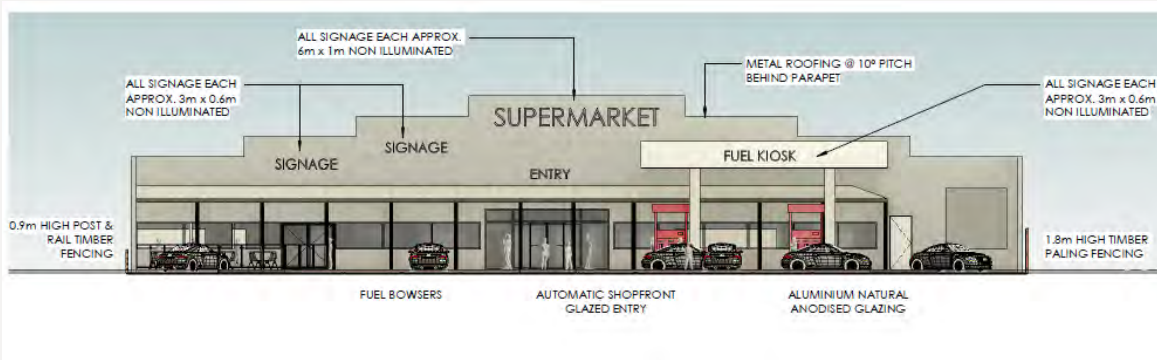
East Elevation indicating proposed signage and façade addressing Commercial Street
